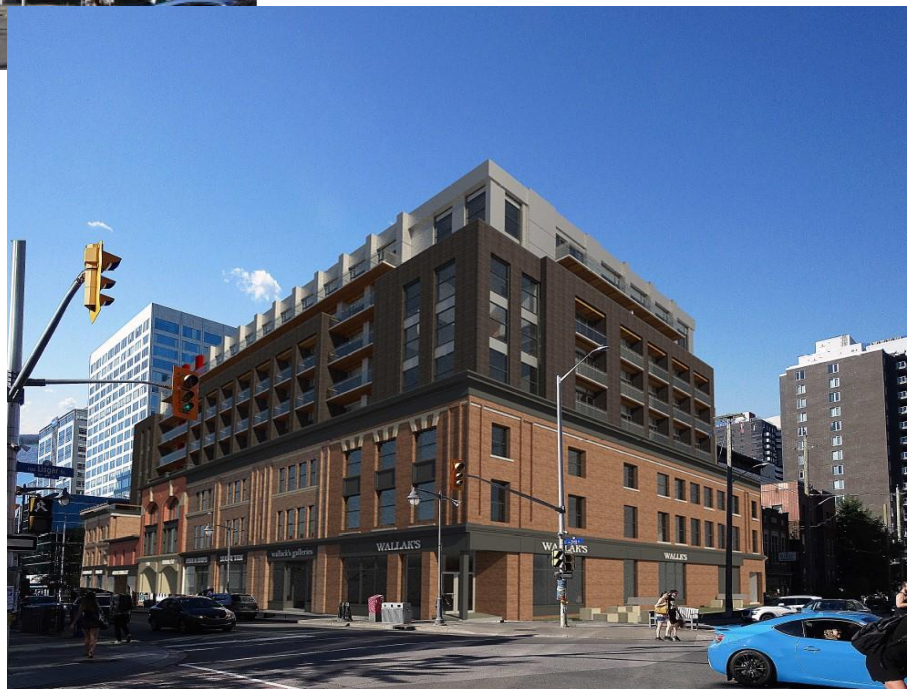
View of the development site looking south showing the existing buildings and the new 9-storey development. Source: Woodman Architecture 2022
